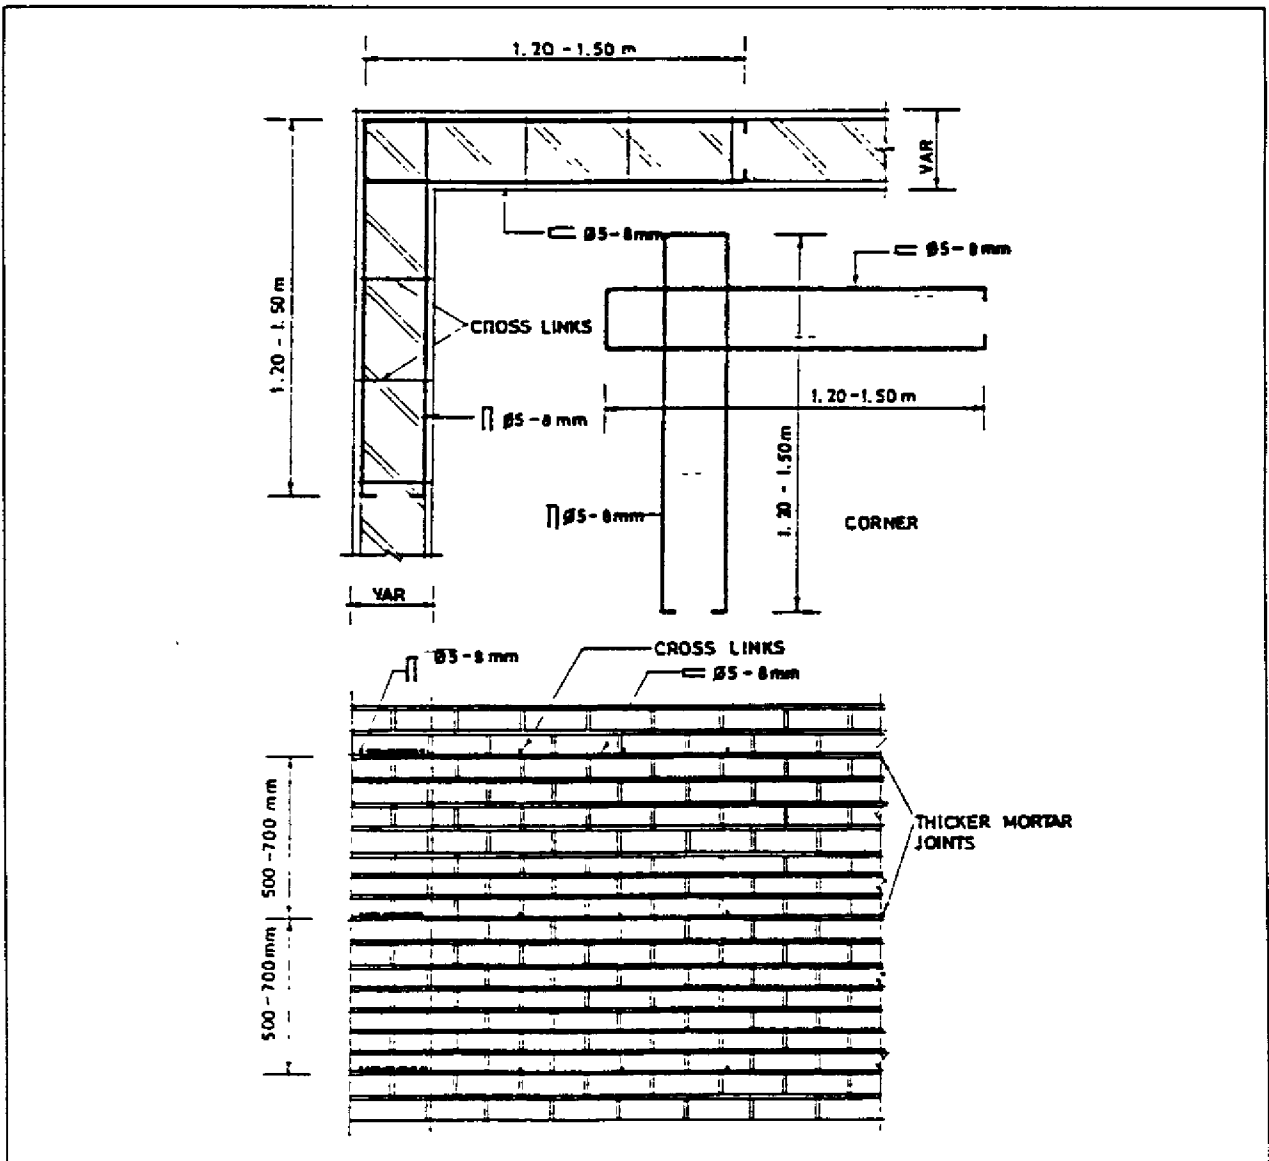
Horizontal Reinforcement Placed in Joint [1]
